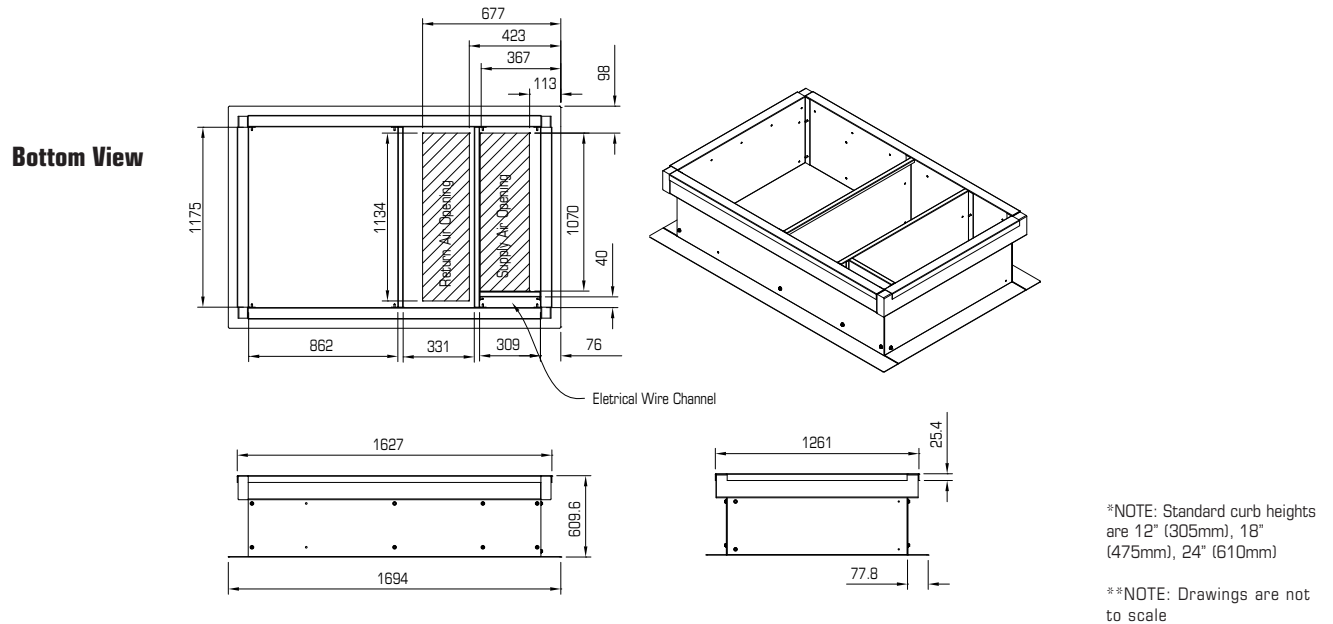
Roofcurb detail for ERV 1300 RT-EC
